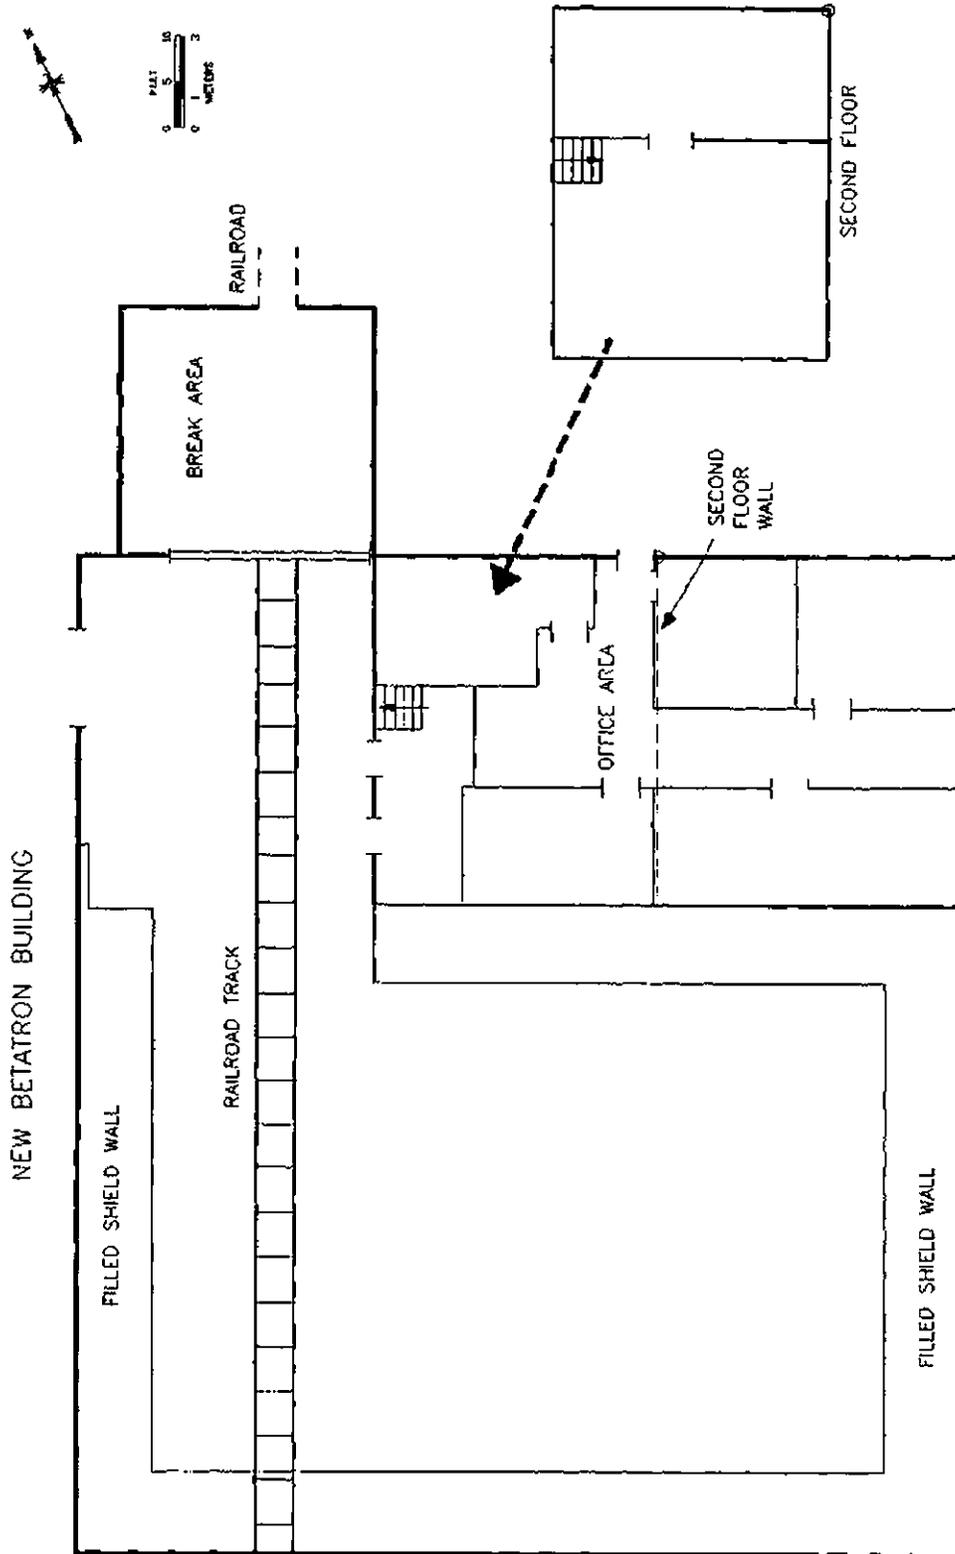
Floor Plan of New Betatron Building (Murray and Uziel 1992, Fig. 3)
